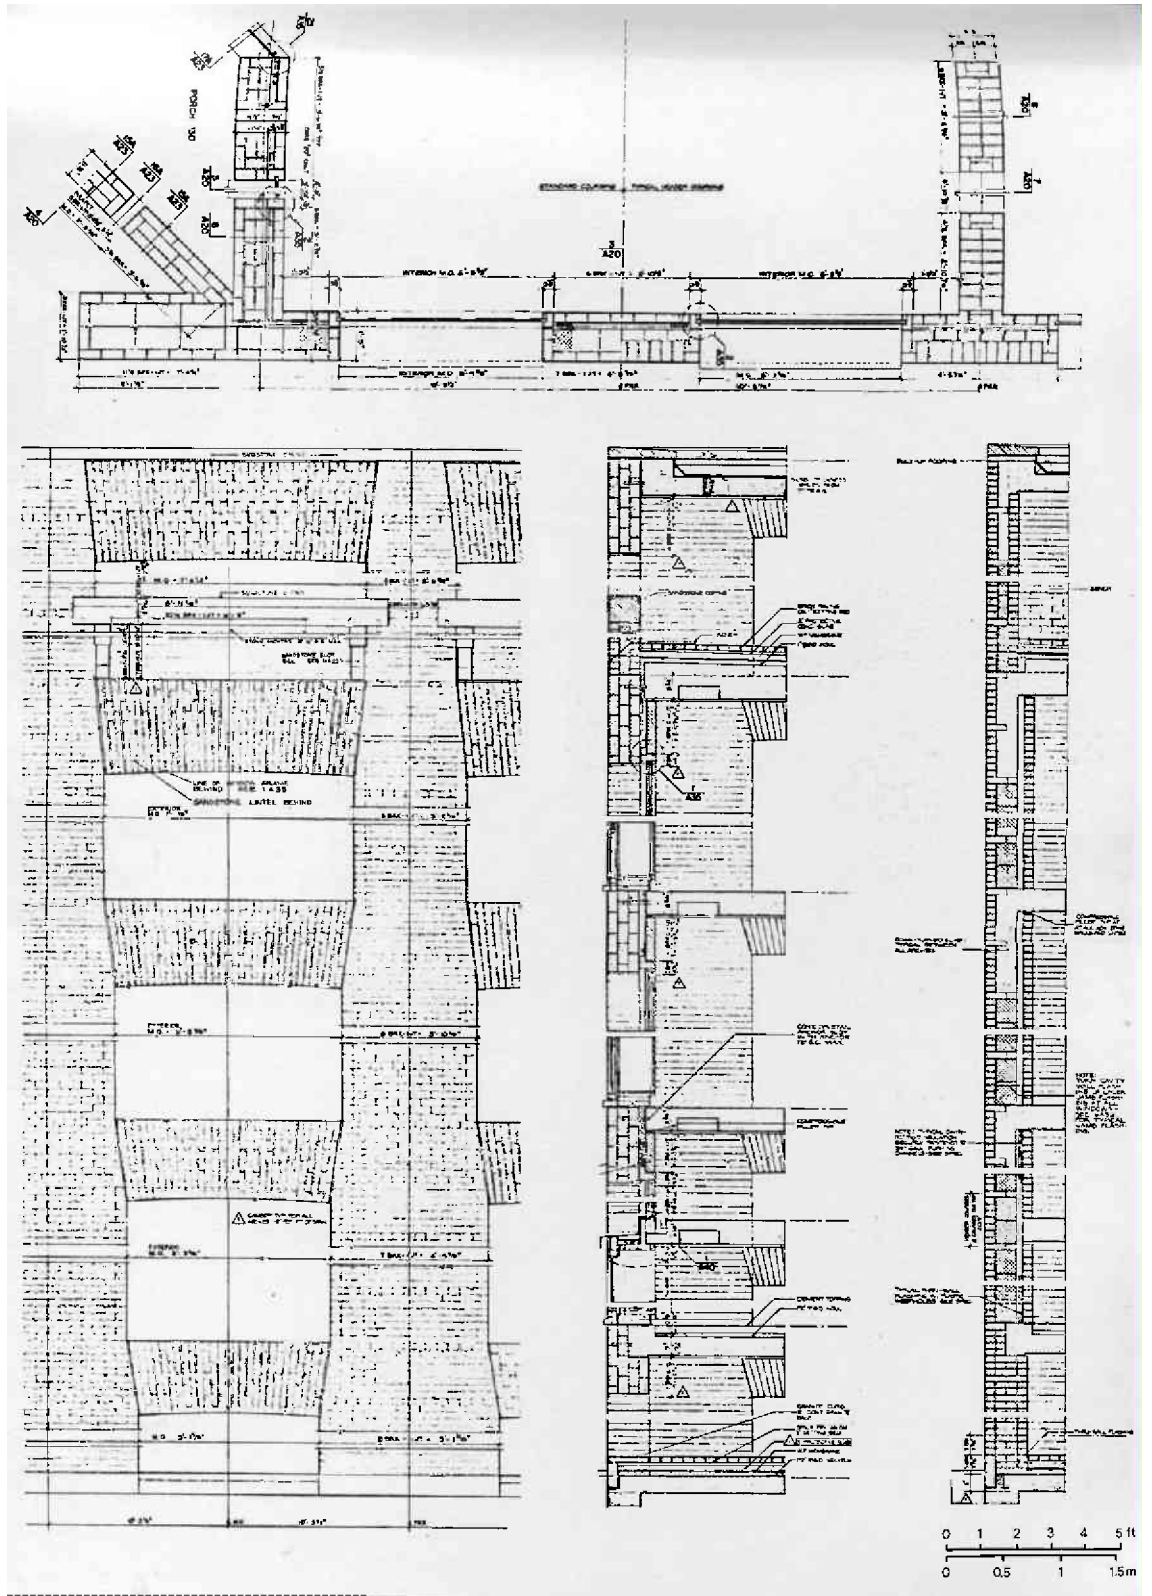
Wall section, Library, Phillip Exeter Academy, USA.
